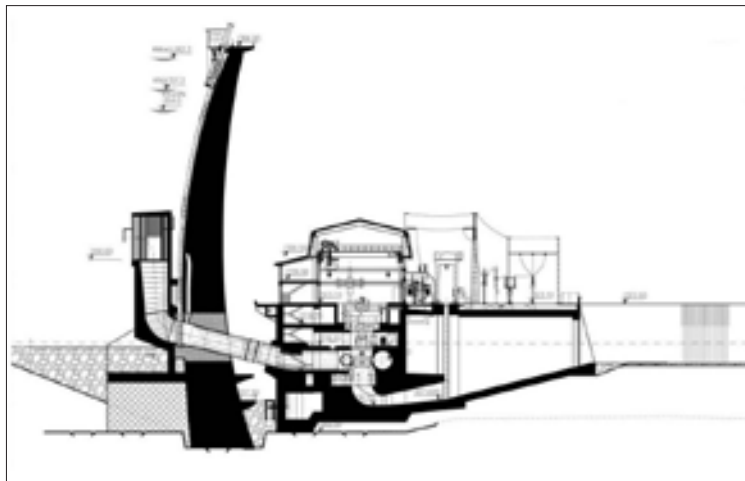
Cross section (1 - 1) of the dam and powerhouse
